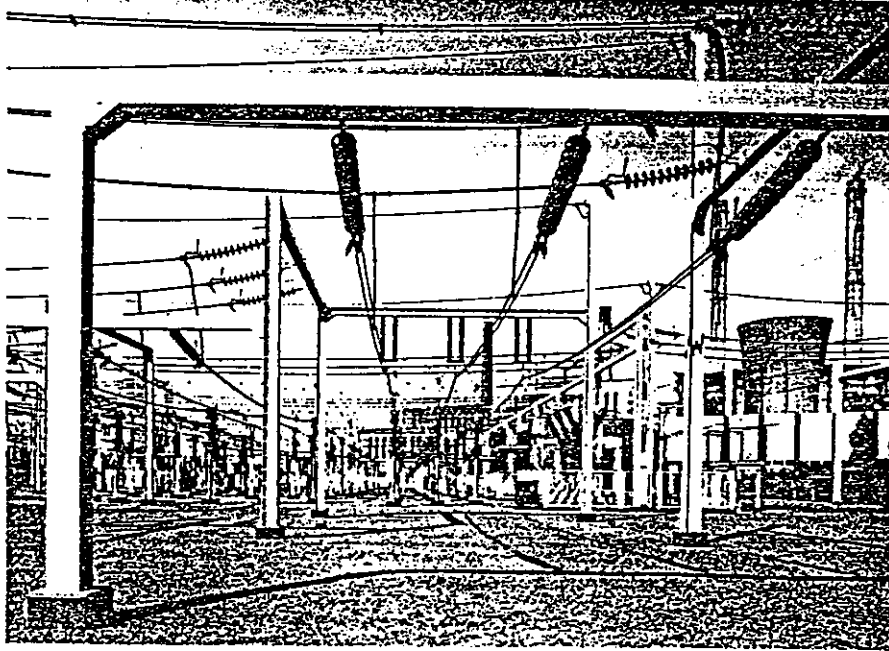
Typical arrangement used in substations with flexible conductors
